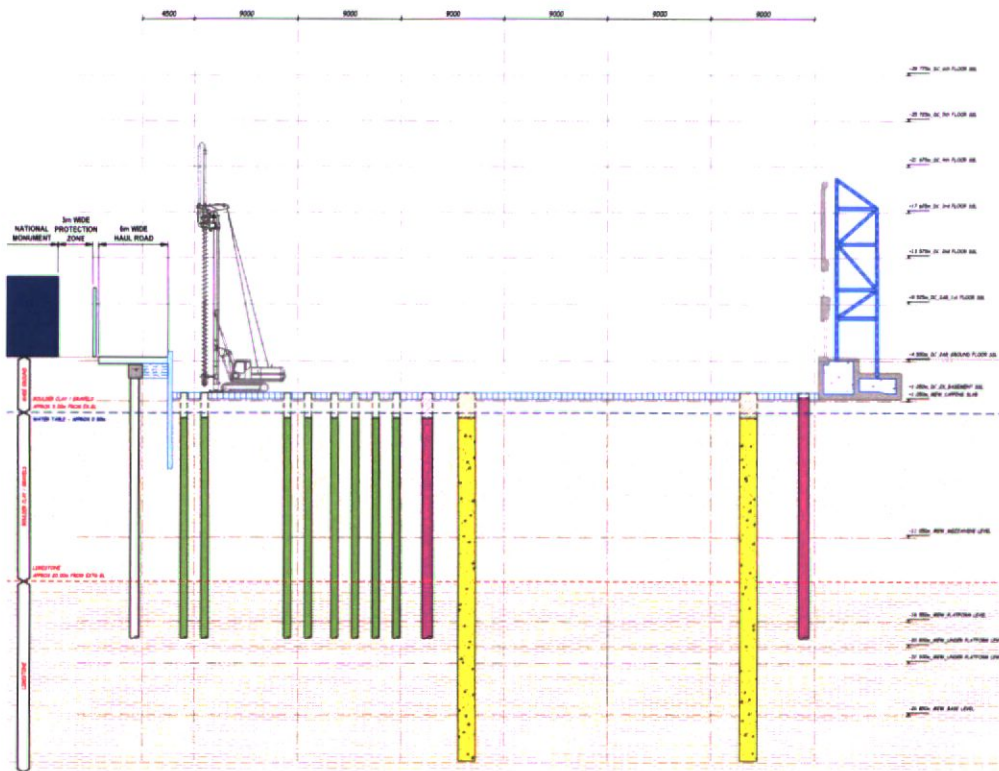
Excavation (3) and D-wall and Piling Installation (4)
